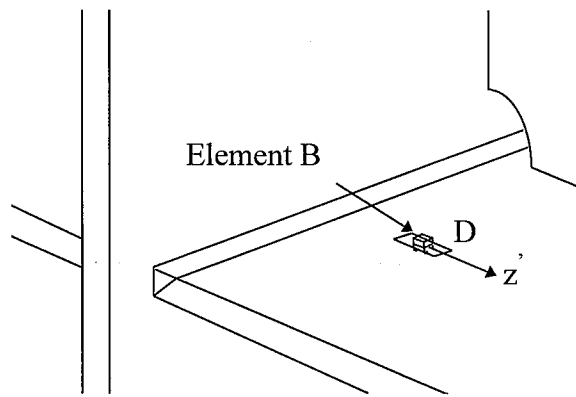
Typical View of Bottom CJP Weld Region (Element B)
